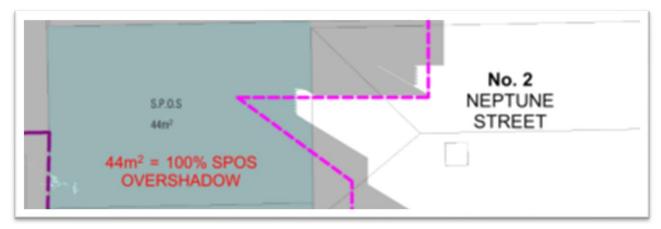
2pm, 3pm shadows at No. 2 Neptune Street
